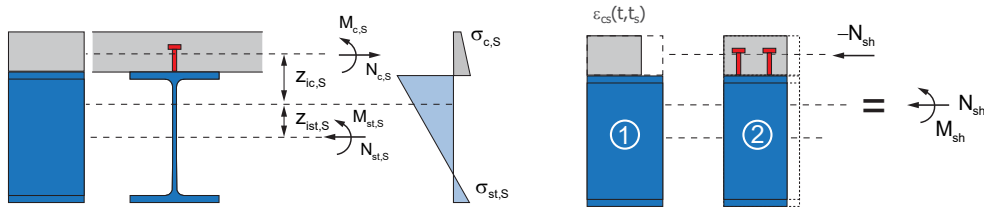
Consider additional stresses from shrinkage of concrete
